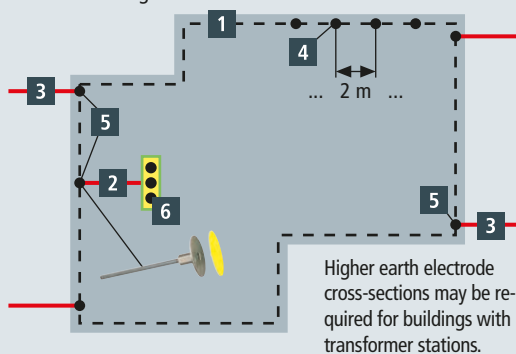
Foundation earth electrode with connection component for the lightning protection system and main equipotential bonding bar
